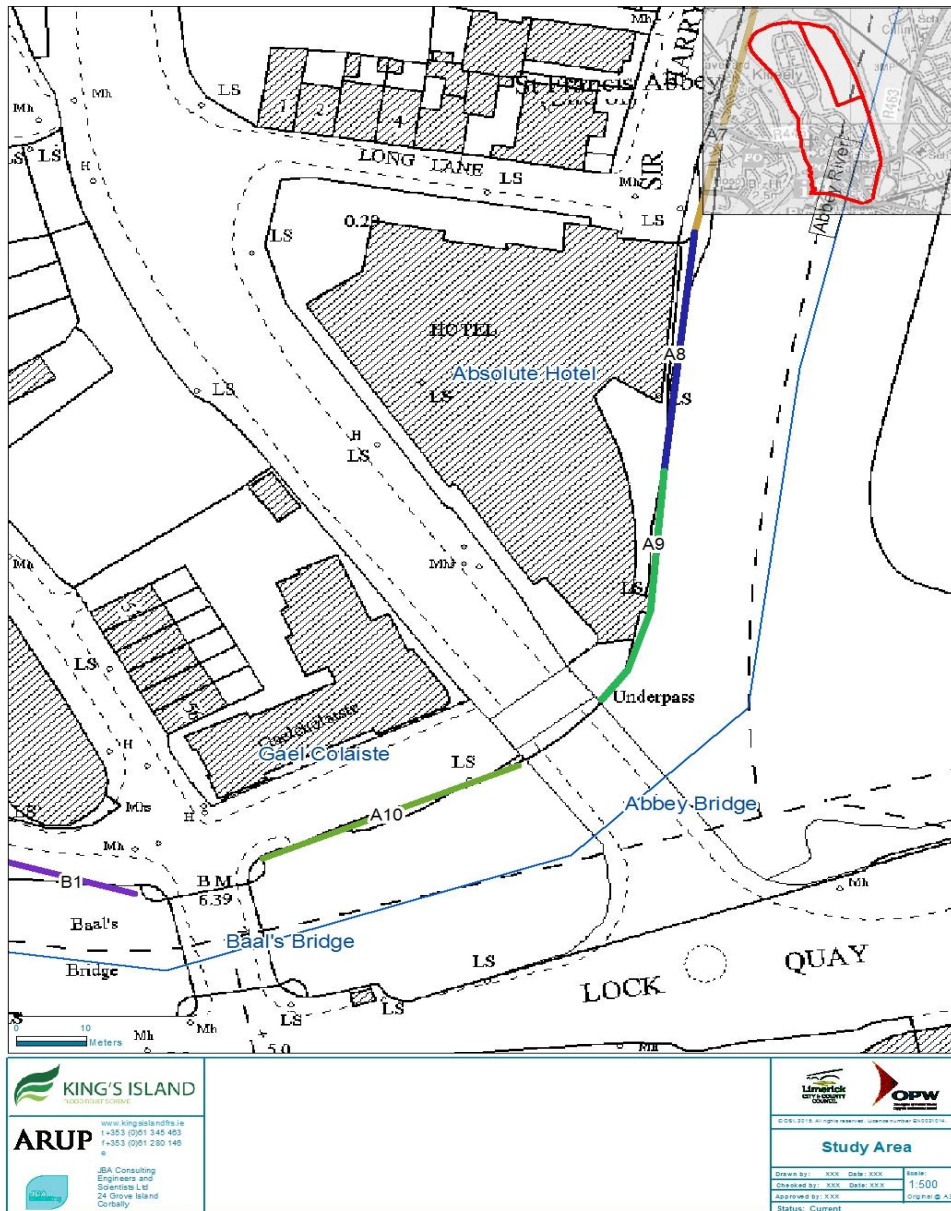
Plan of Areas A7-B1 around Absolute Hotel
